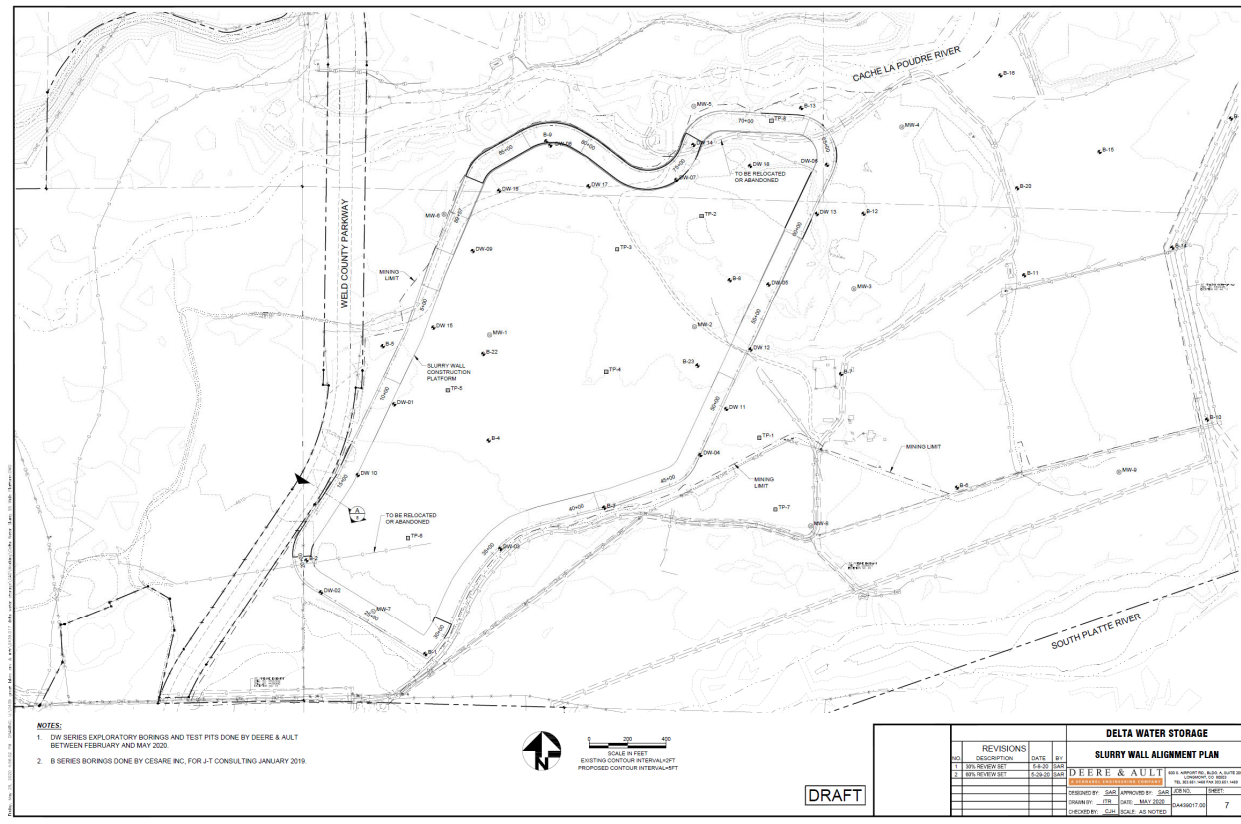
Delta Water Storage Slurry Wall Alignment Plan
